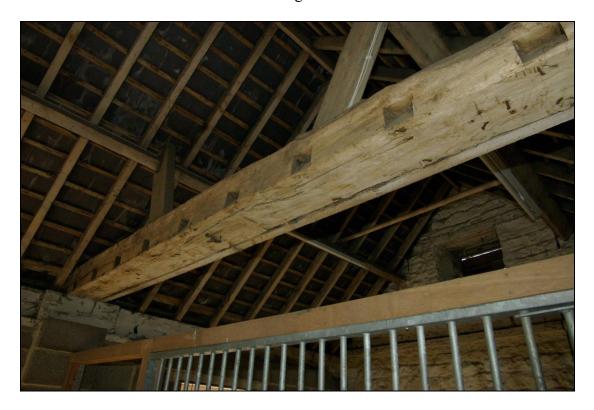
Barn A re-used roof timbers with carpenter's marks.
